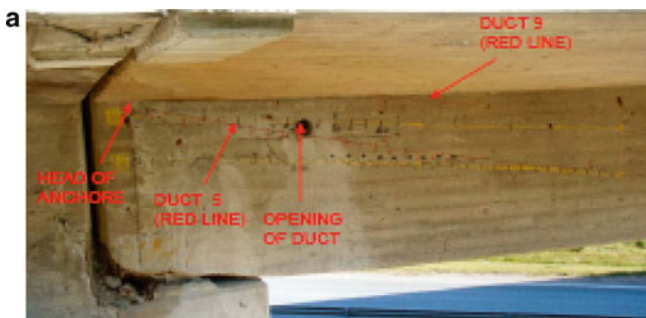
Investigation area at prestressed concrete bridge. Concrete cover of first layer of tendons: 125 mm
